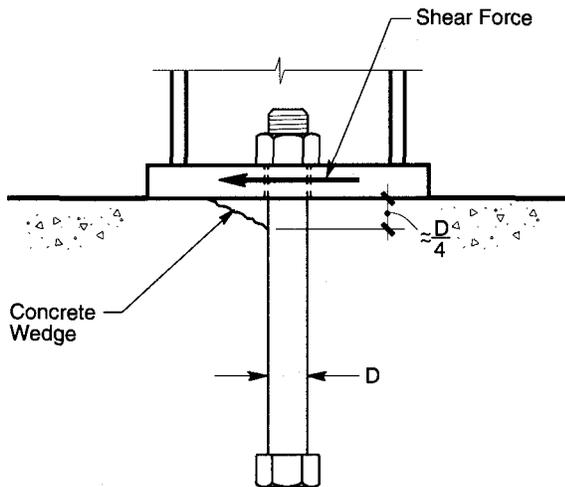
Concrete Wedge Formed by Shear Force in Anchor Bolt
